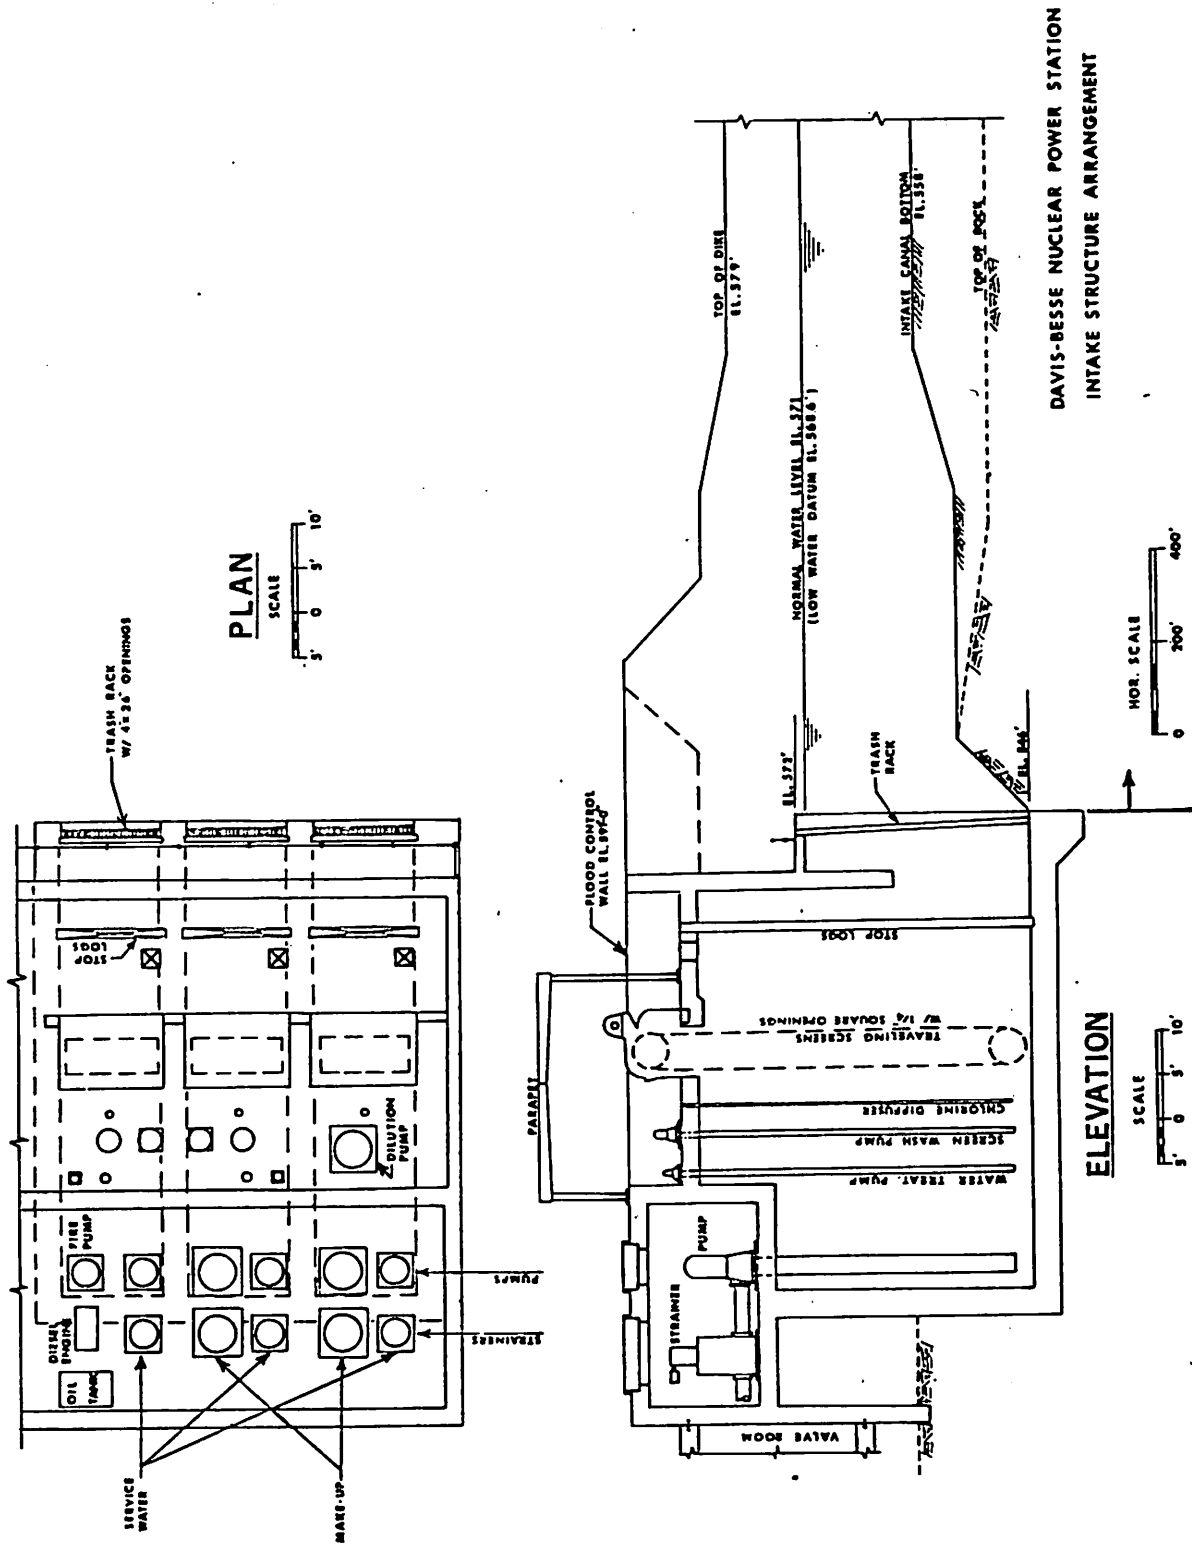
WATER INTAKE PUMPS AND SCREENS ARRANGEMENT
